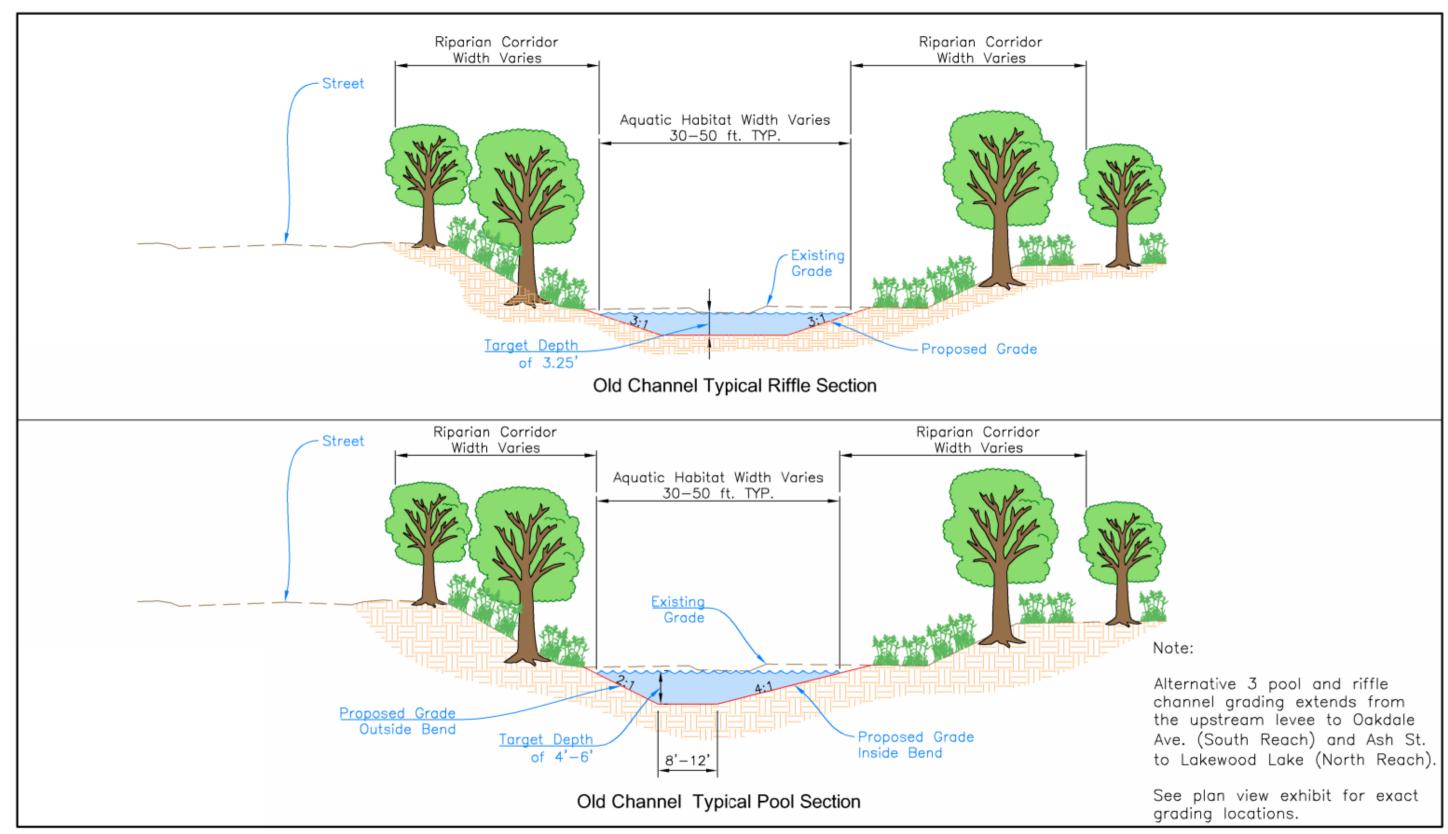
Alternative A3 Non-Uniform Channel Typical Pool and Riffle Sections
